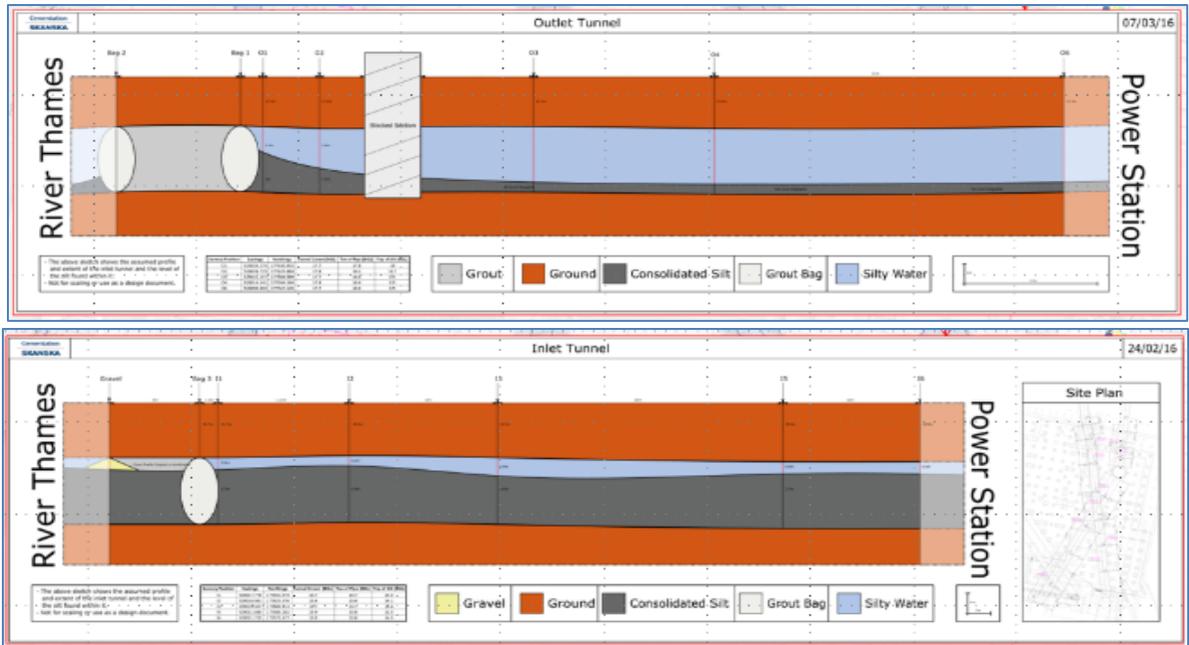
Longitudinal section of cooling water tunnels showing silt, water and stop-end positions
